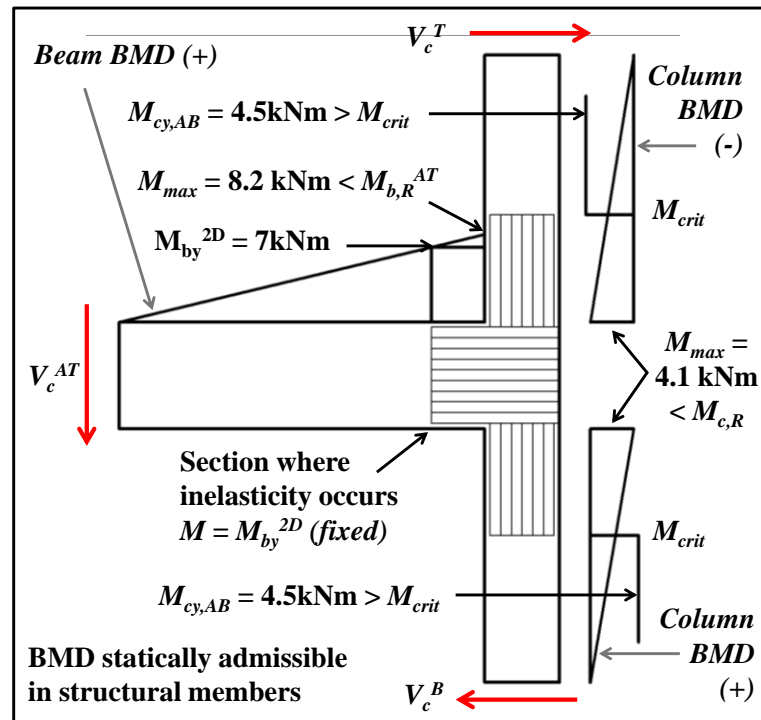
Statically admissible BMD of the collapse mechanism, long span beam column joints.
